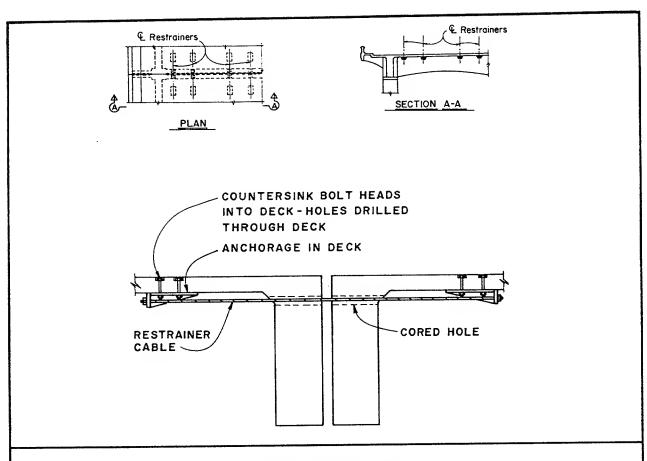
Expansion Joint Restrainers Tied to the Concrete Deck (from Reference 5)
